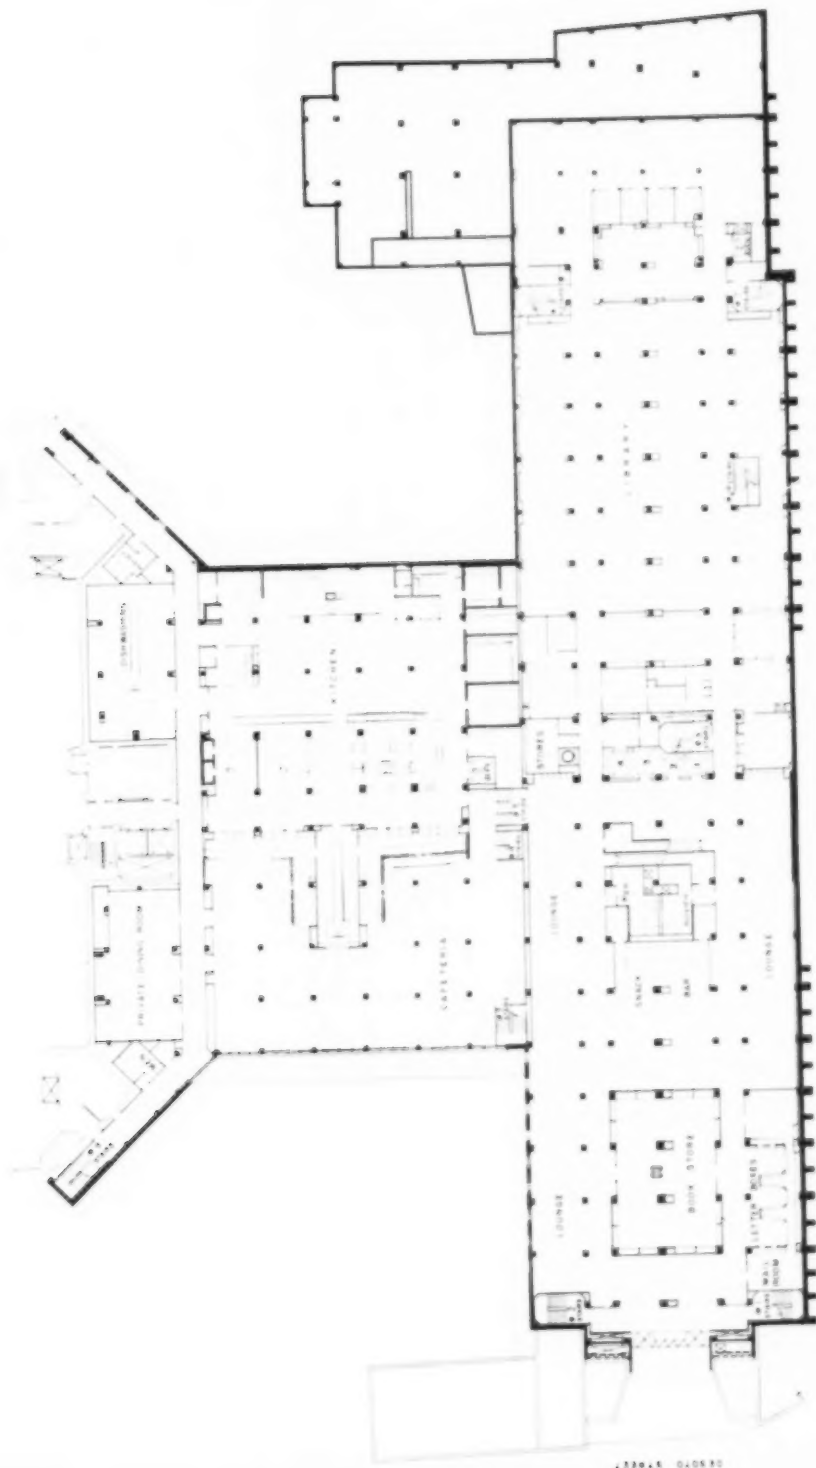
SECOND FLOOR PLAN, SCHOOLS OF THE HEALTH PROFESSIONS BUILDING,
